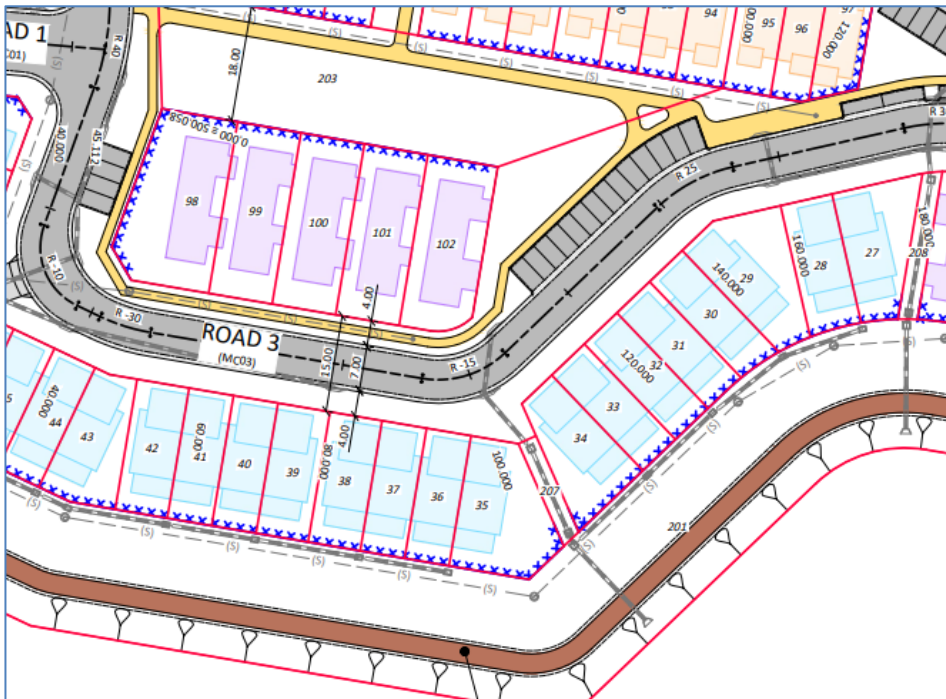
Engineering plans showing an area 4m occurs between formed road and the edge of the allotments. The available space for tree planting to the south of units 98-102 is impacted by the proposed footpath. Retaining wall are also present to the north of Lots 98-102.
